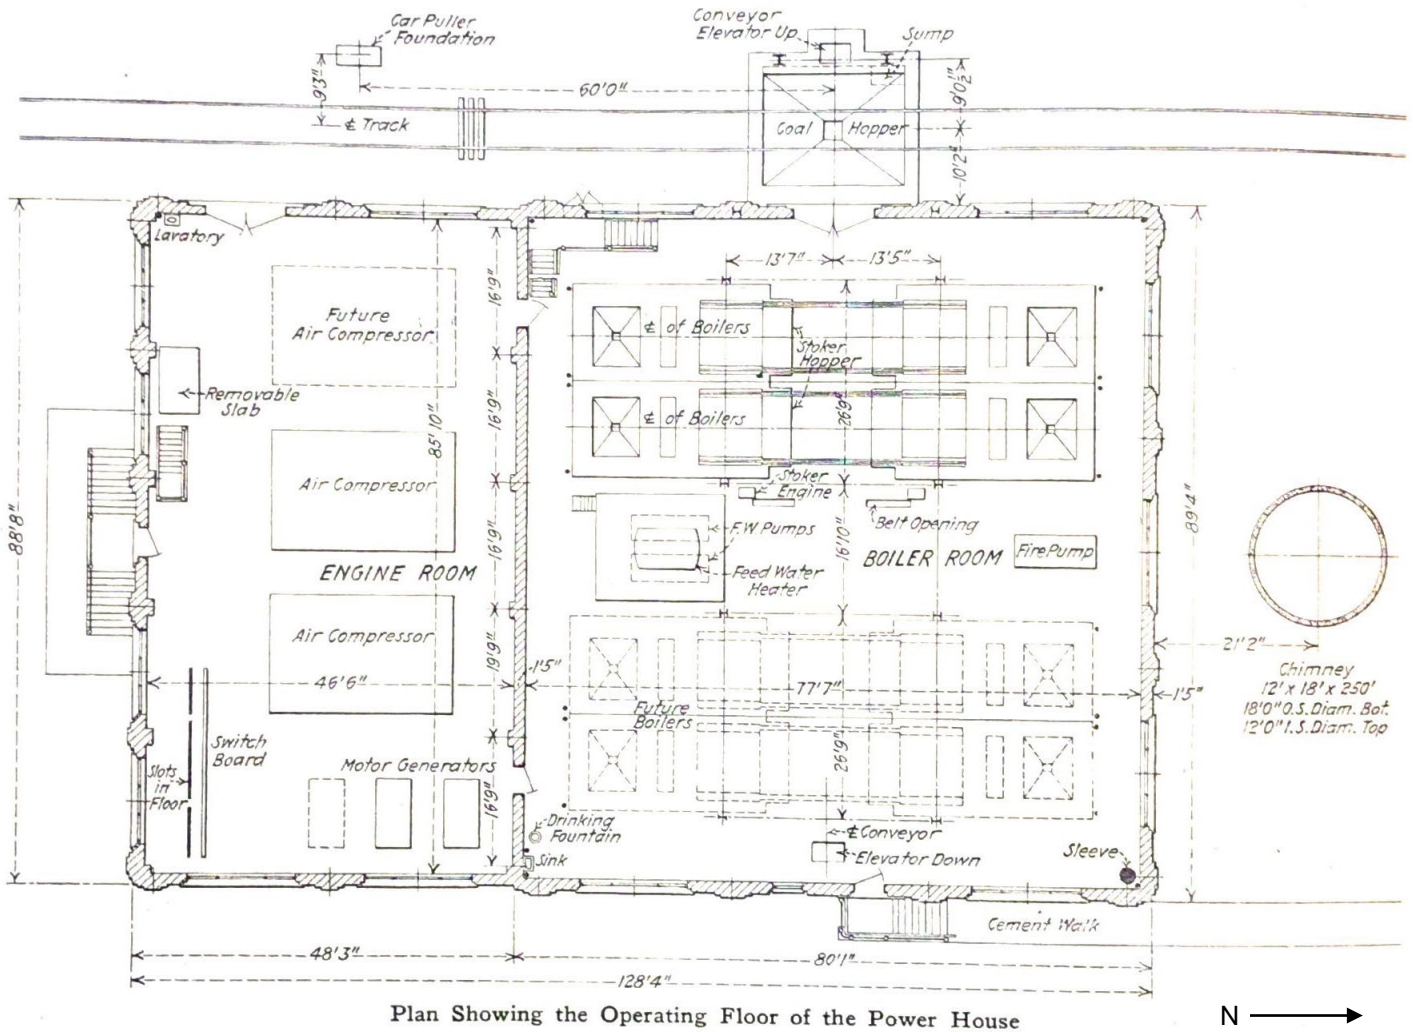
Floor plan of main floor of Powerhouse from *Railway Age*, (29 November 1924): 990. Water Tank to south not shown.
